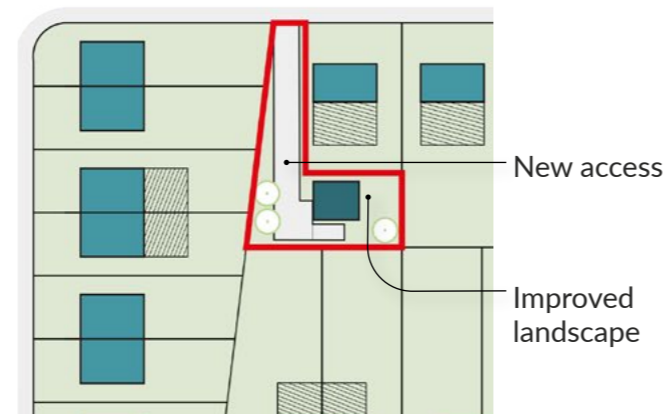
Plan diagram showing how that typical site might be developed as a private rear space development.
